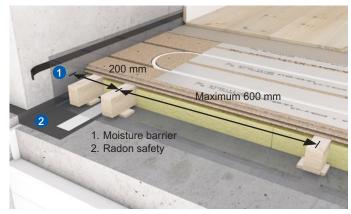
Climate Floor installed on joists with turning grooves cut at the construction site.
